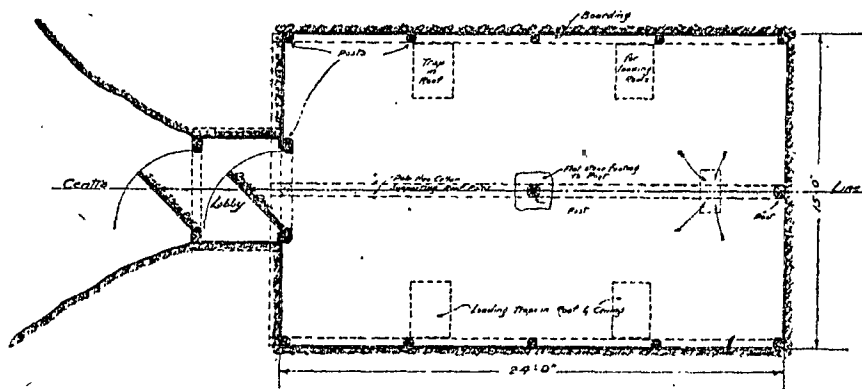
PLAN OF UNDERGROUND ROOT CELLAR.
